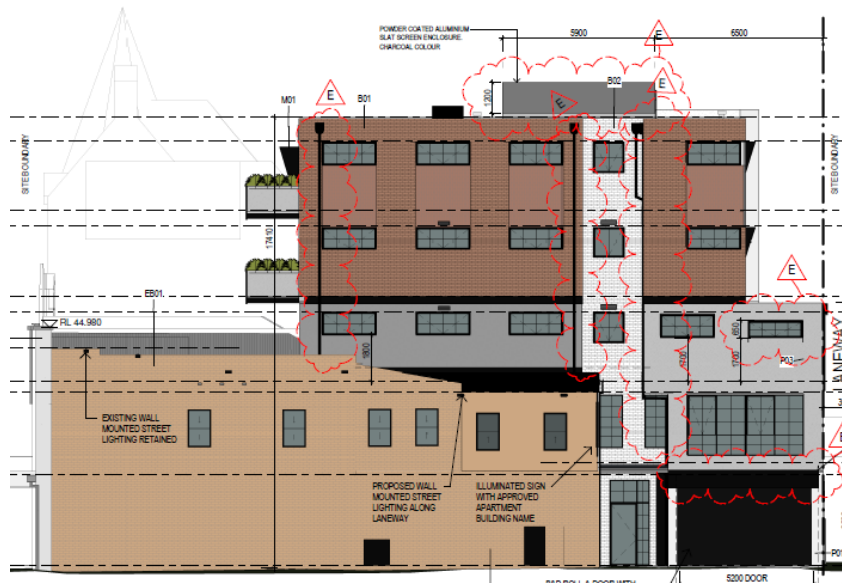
North-eastern laneway elevation (Former ANZ bank ghosted)
